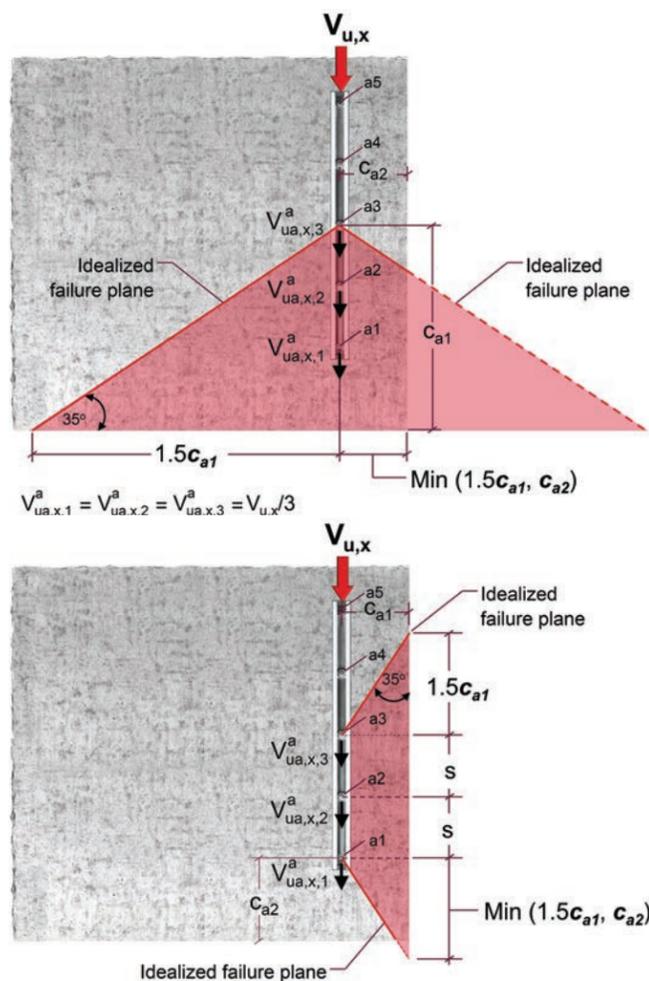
Example for the calculation of anchor channels with 6 anchors loaded in shear longitudinal to the channel axis for concrete edge failure.
